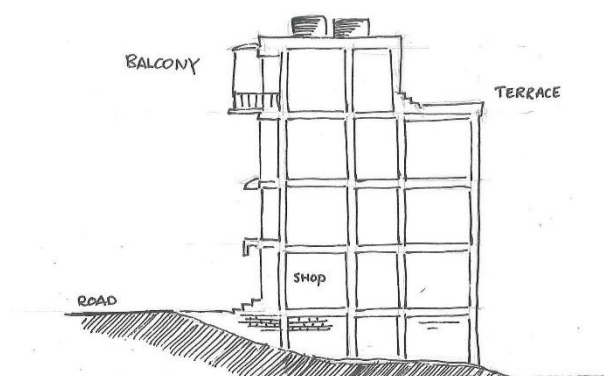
Typical RCC frame construction (Shock Safe Nepal group 1).
